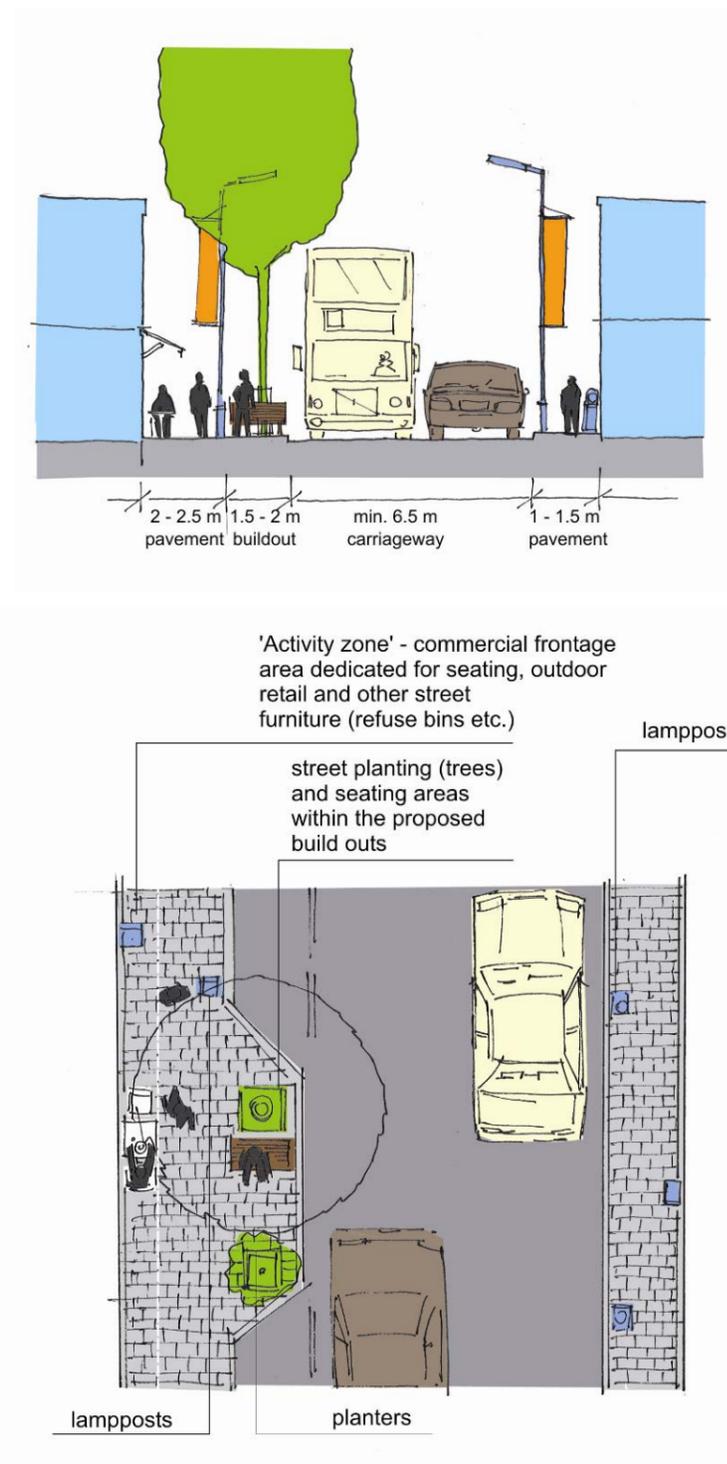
Cross-section of the Strand Road within the Village Core Area
